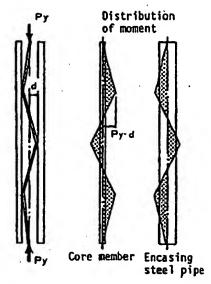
Effect of the wavy deformation of the core member (on the encasing steel pipe)
